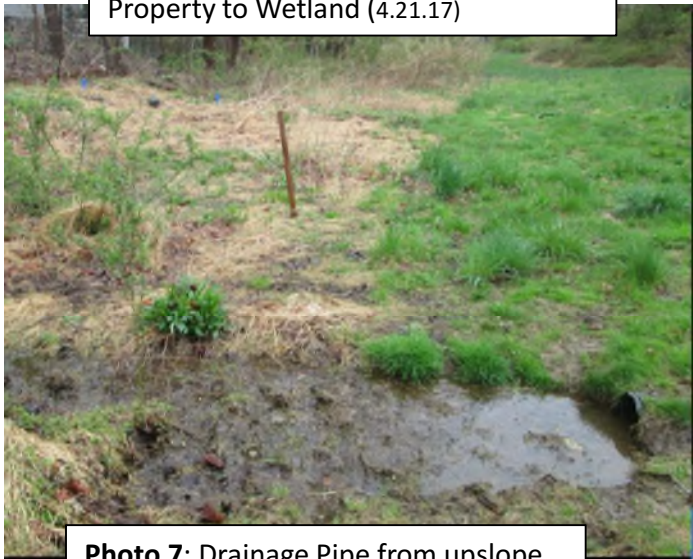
Drainage Pipe from upslope onsite parcel to Wetland (4.21.17)
